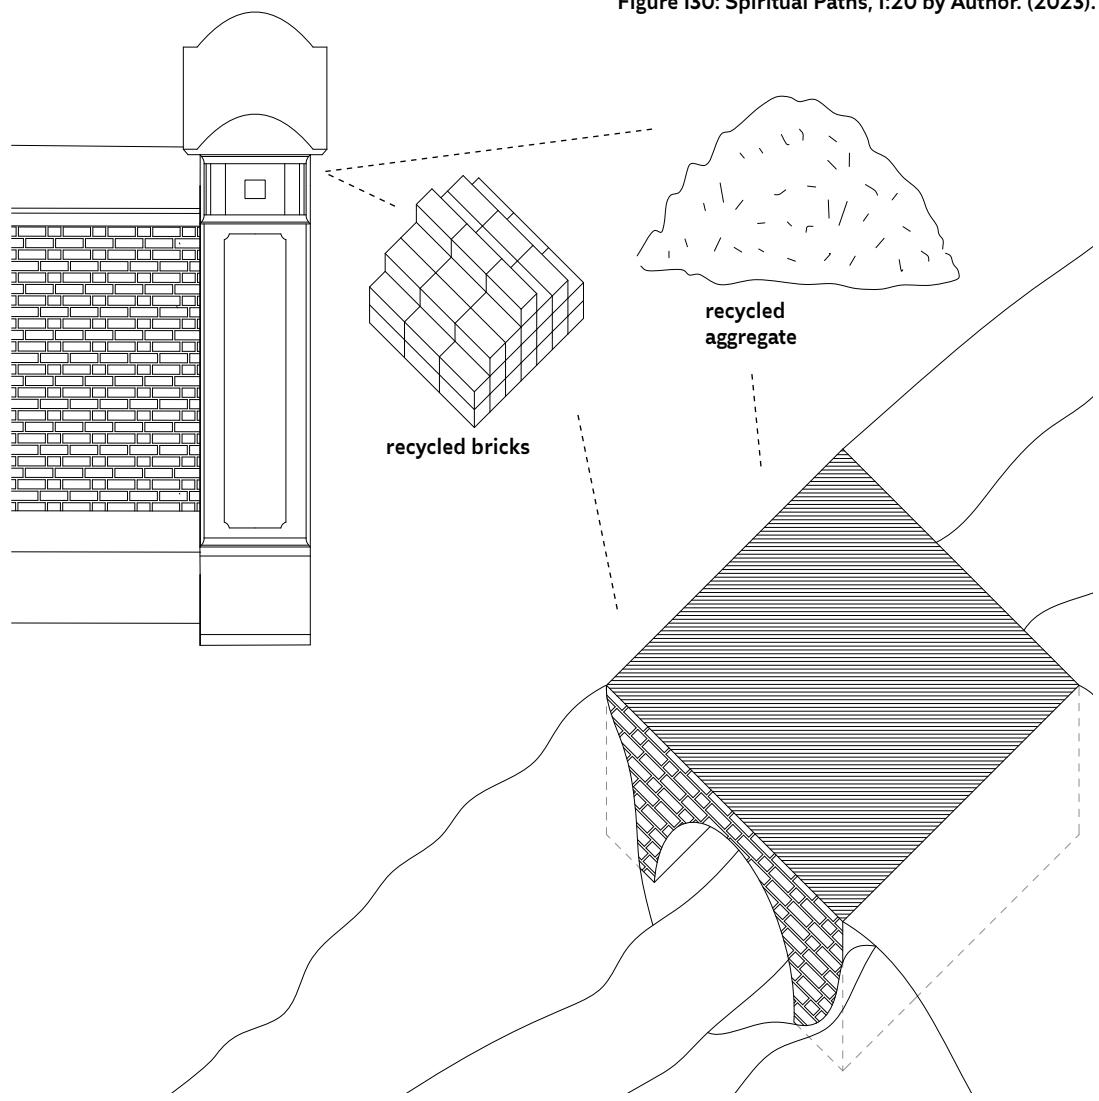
From separating walls to connecting bridges, I:200. by Author. (2023). [drawing]
